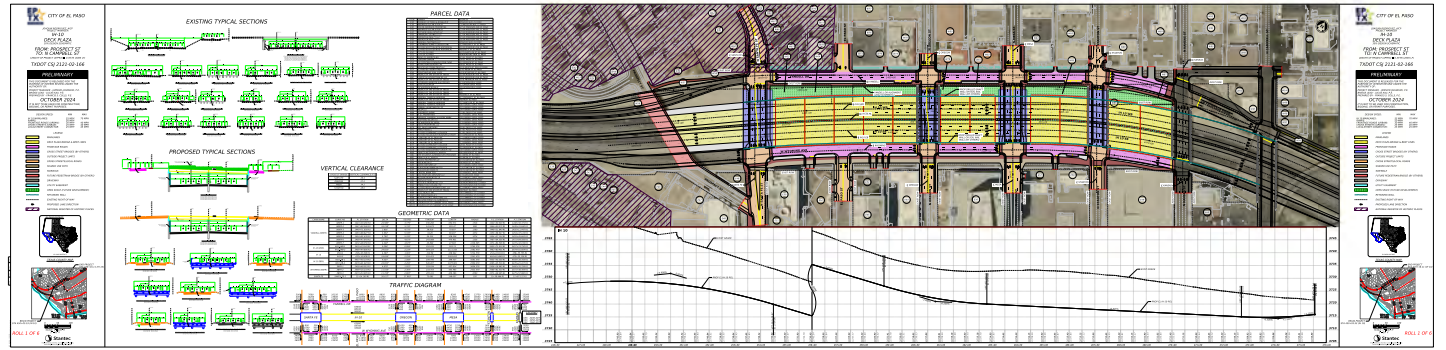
El Paso Deck Plaza Civil Schematic Plan
